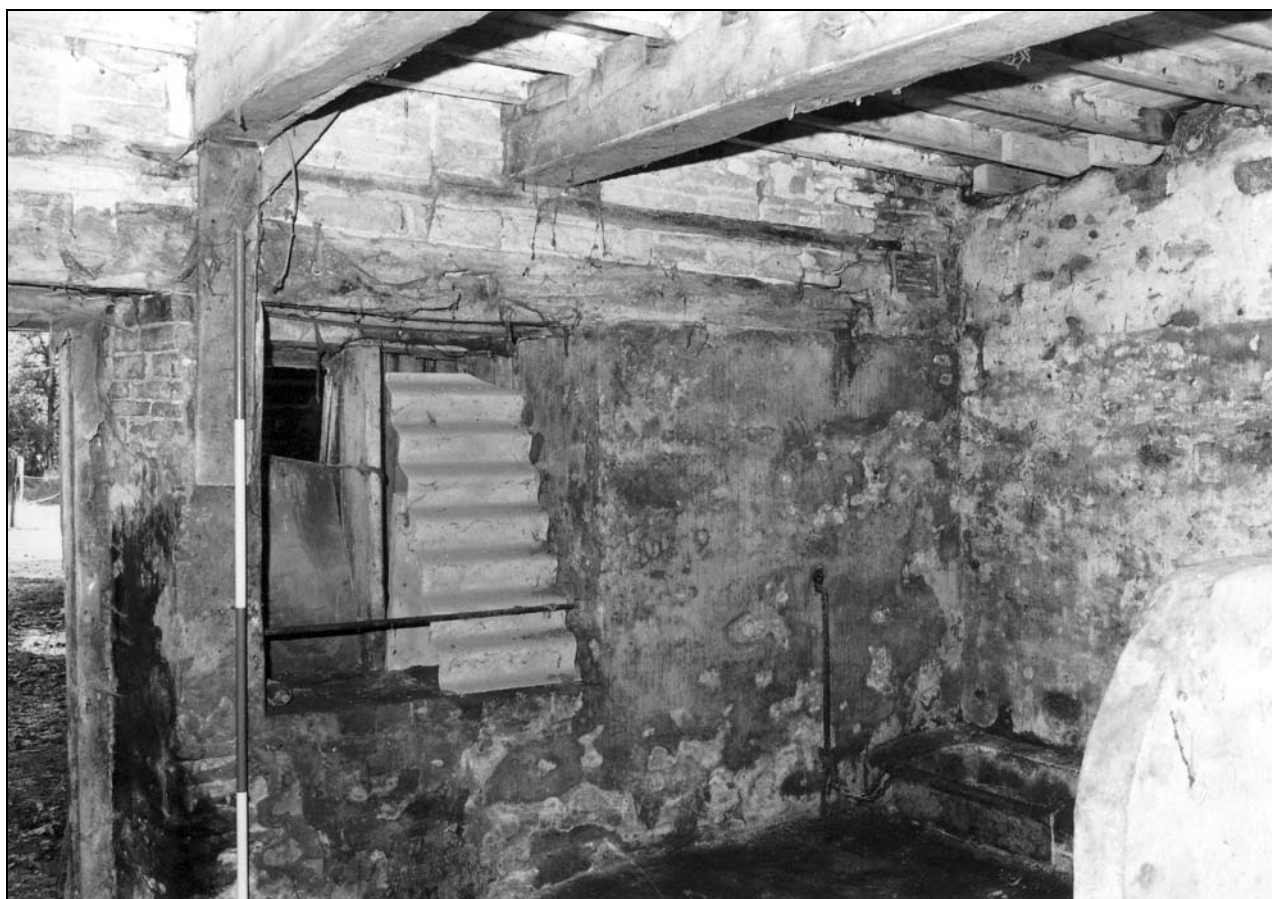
Building 2: ground floor, from the north-west (film 3, frame 1)
